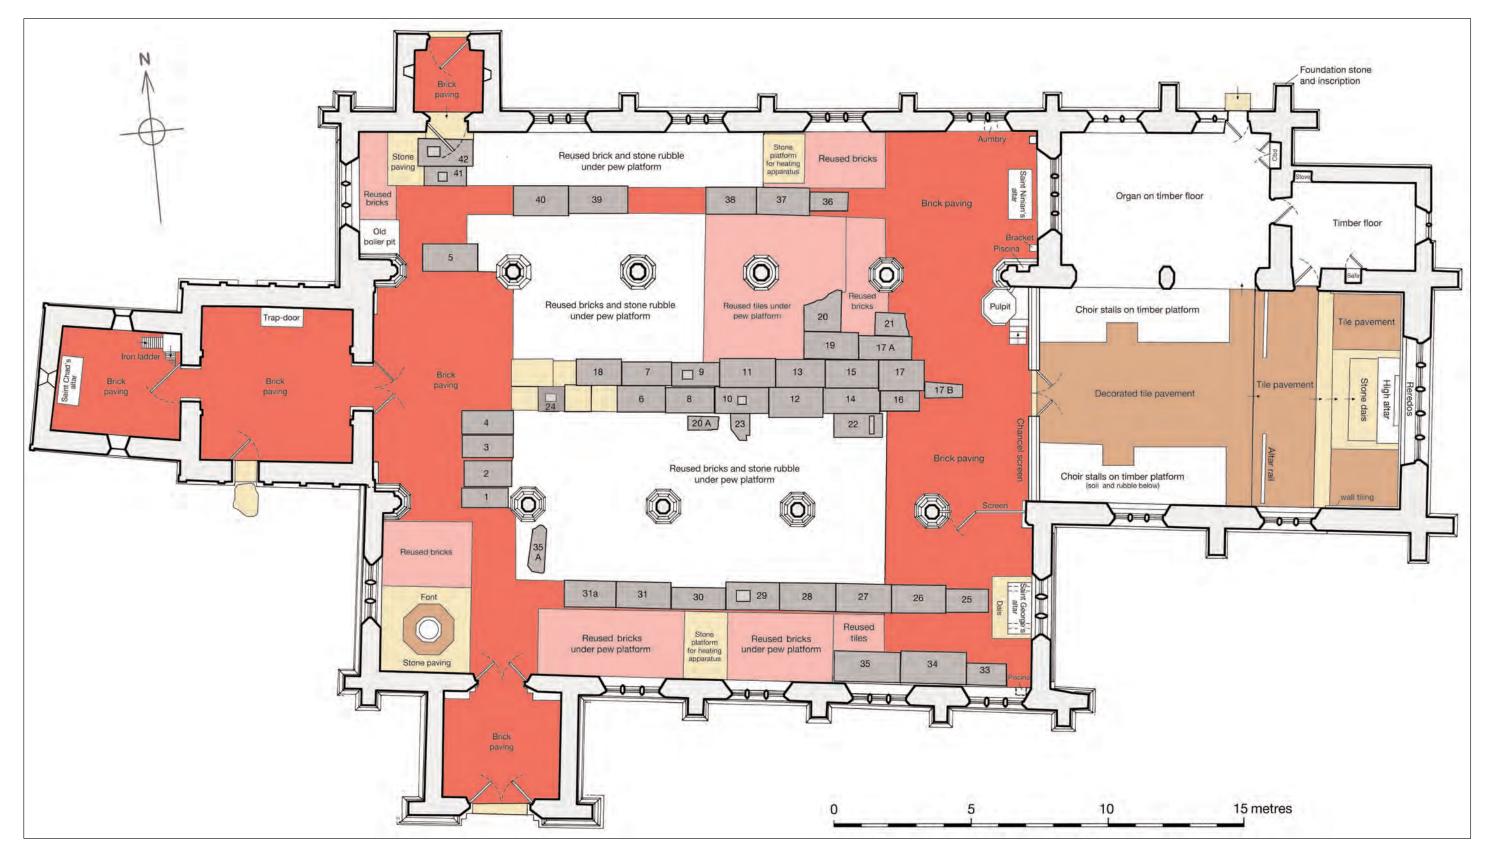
Plan showing the flooring materials, disposition of memorial slabs and major furnishings in 1978. Timber pew platforms have been omitted for clarity. Drawing: Warwick Rodwell
